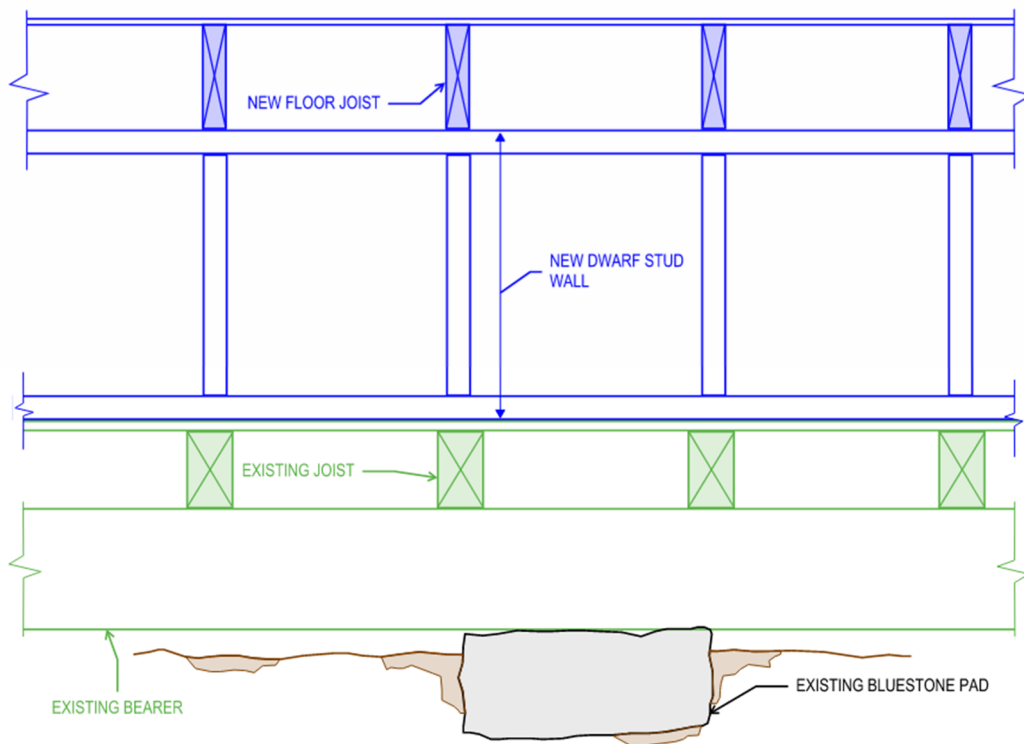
Cross-section view (looking north) of floor build-up to achieve required level
